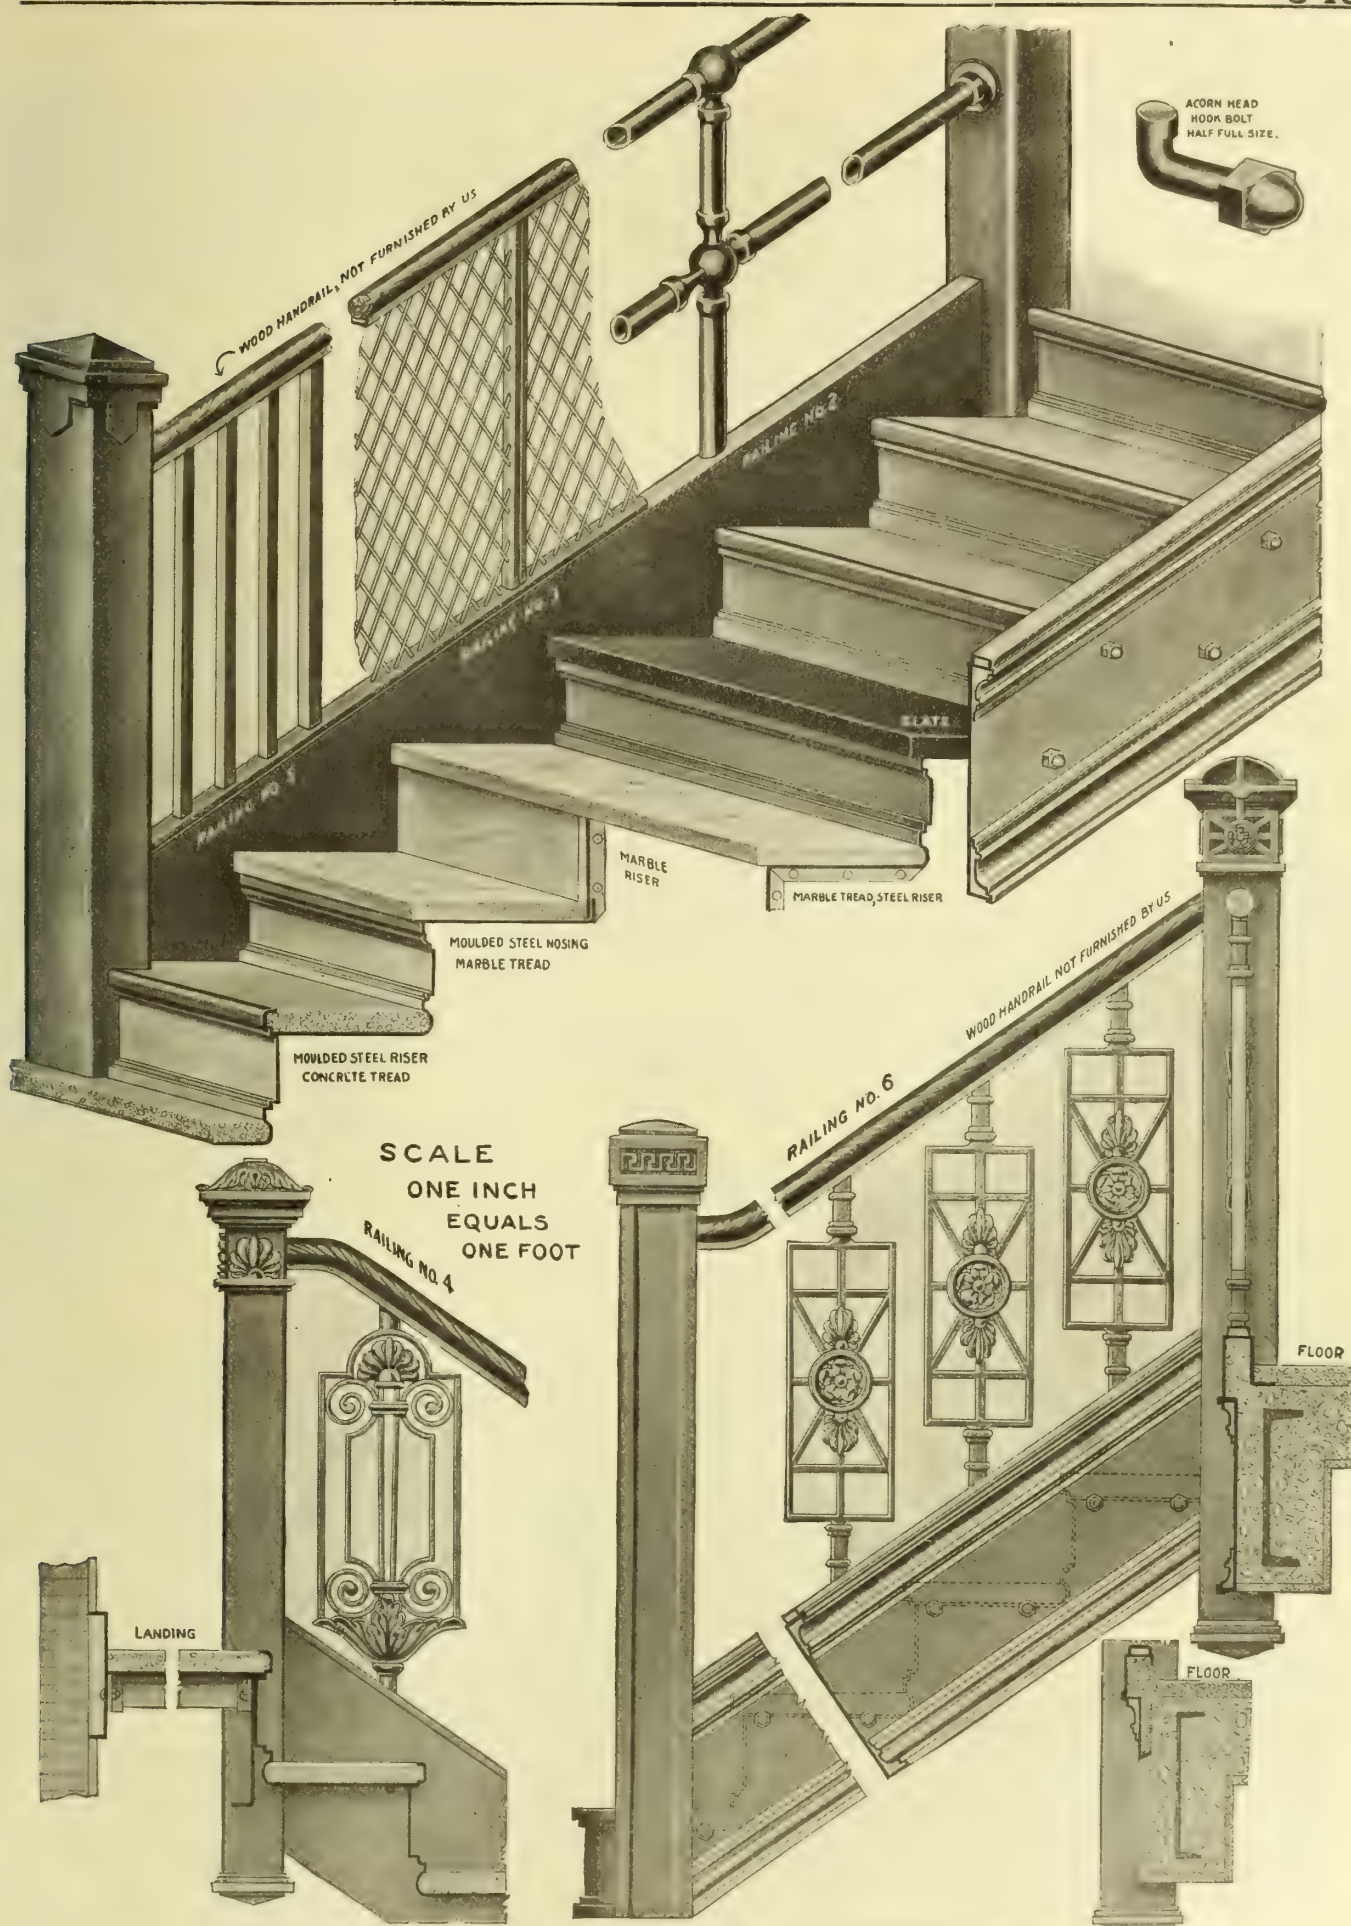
DETAILS MESKER COMBINATION STEEL AND CONCRETE INTERIOR STAIRS
